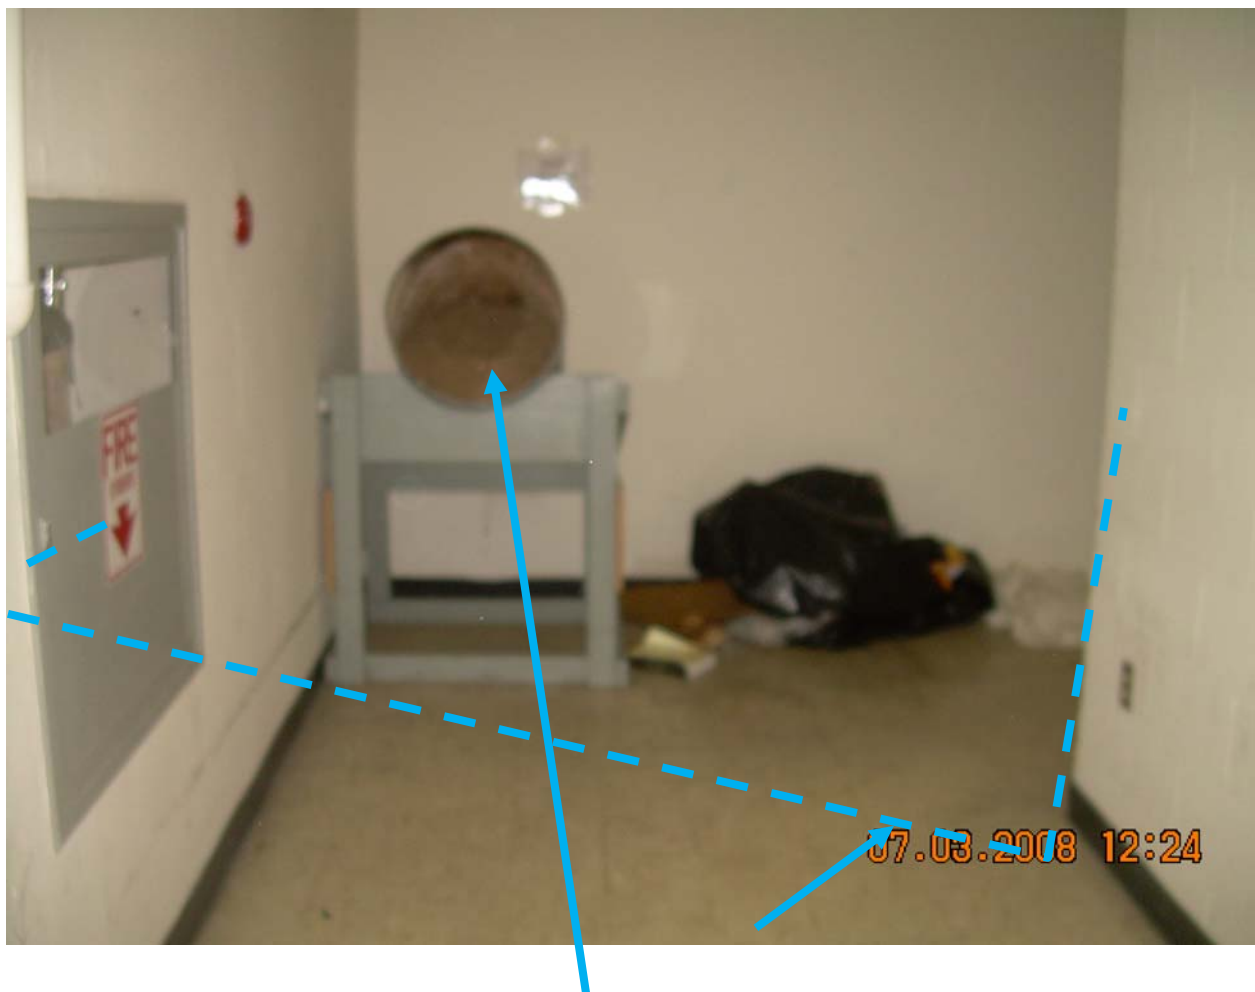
Contaminated soil in drum in Basement Phase 3 work area, should be treated as lead contaminated waste.
